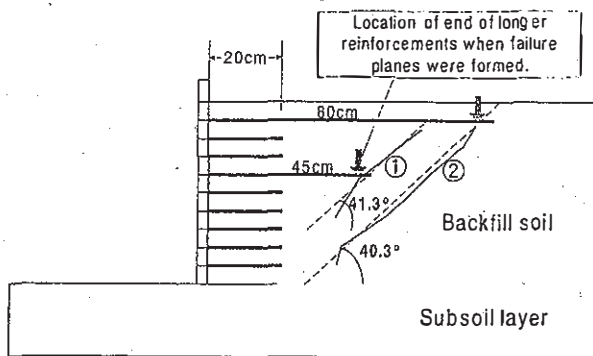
Comparison of locations of failure planes and longer reinforcement layers for reinforced-soil retaining wall type 2
